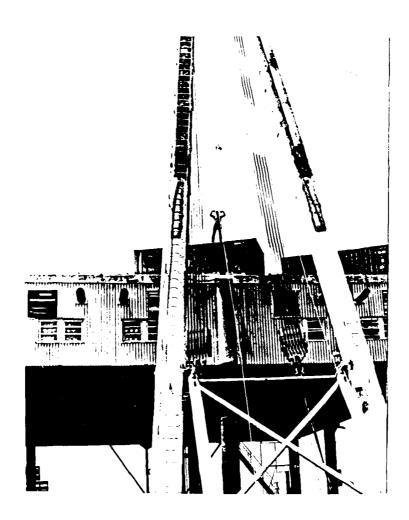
Photo of Lifting the Sub-Contractor's Containers of Asbestos Removal Gear on Stage I (containers included equipment, protective gear, a "clean room" with shower and were used to store and transport materials removed from the stages)
